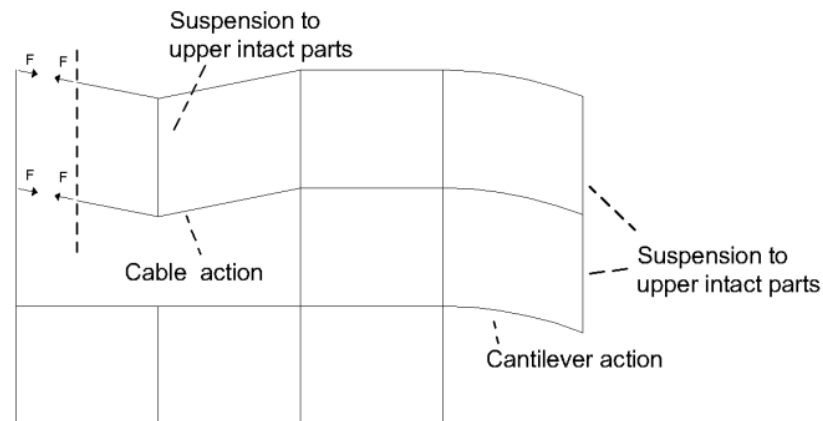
Redistribution of forces to remaining members after loss of an element (Kjellman, 2017, p.12)
